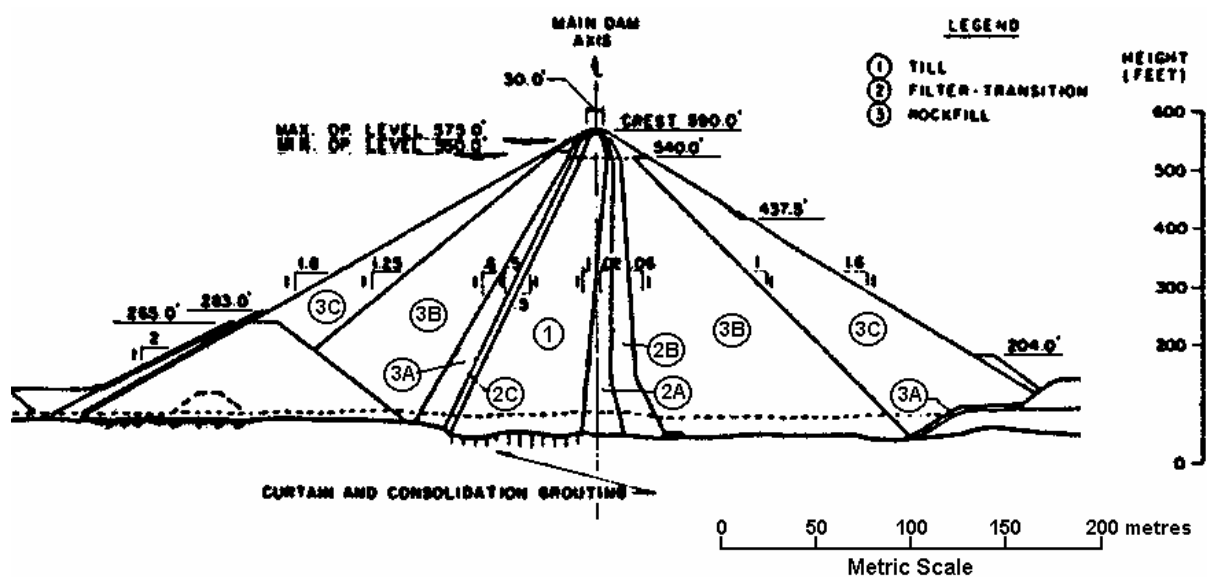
LG-2 dam, typical cross section (Dascal 1987)
